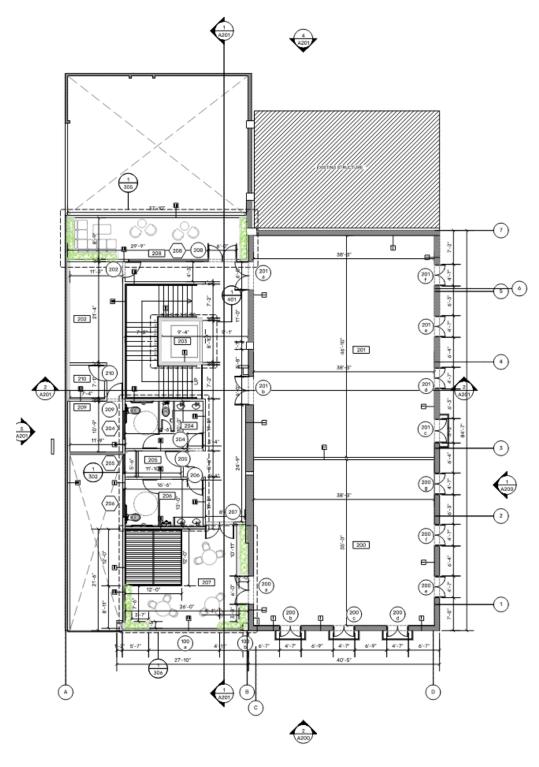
Proposed First Floor Plan (Ingenium 2023)
